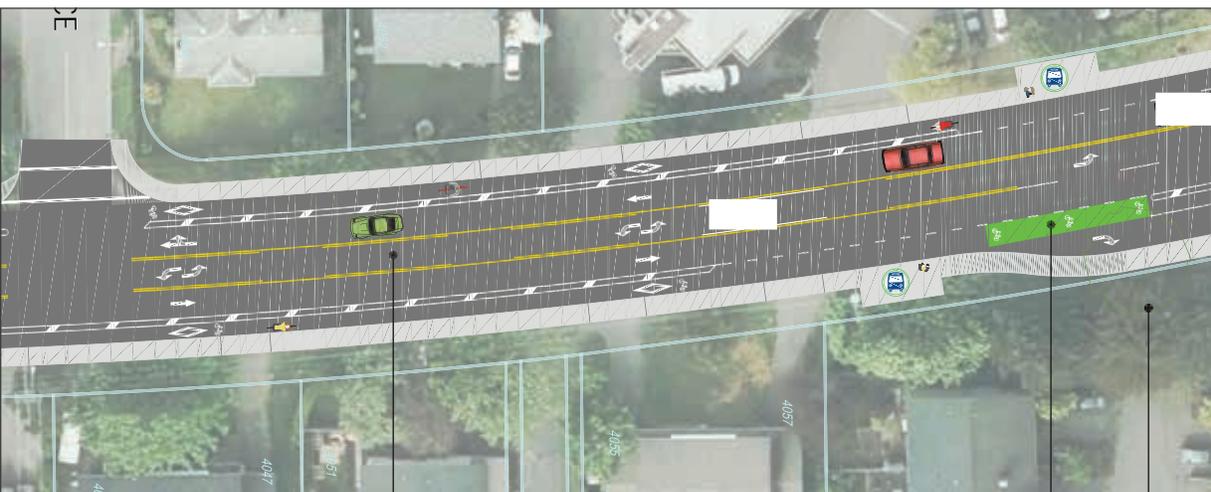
| Shelbourne Street Concept Example, Christmas Avenue to Garnet Road and north of McKenzie Avenue to Torquay Drive
